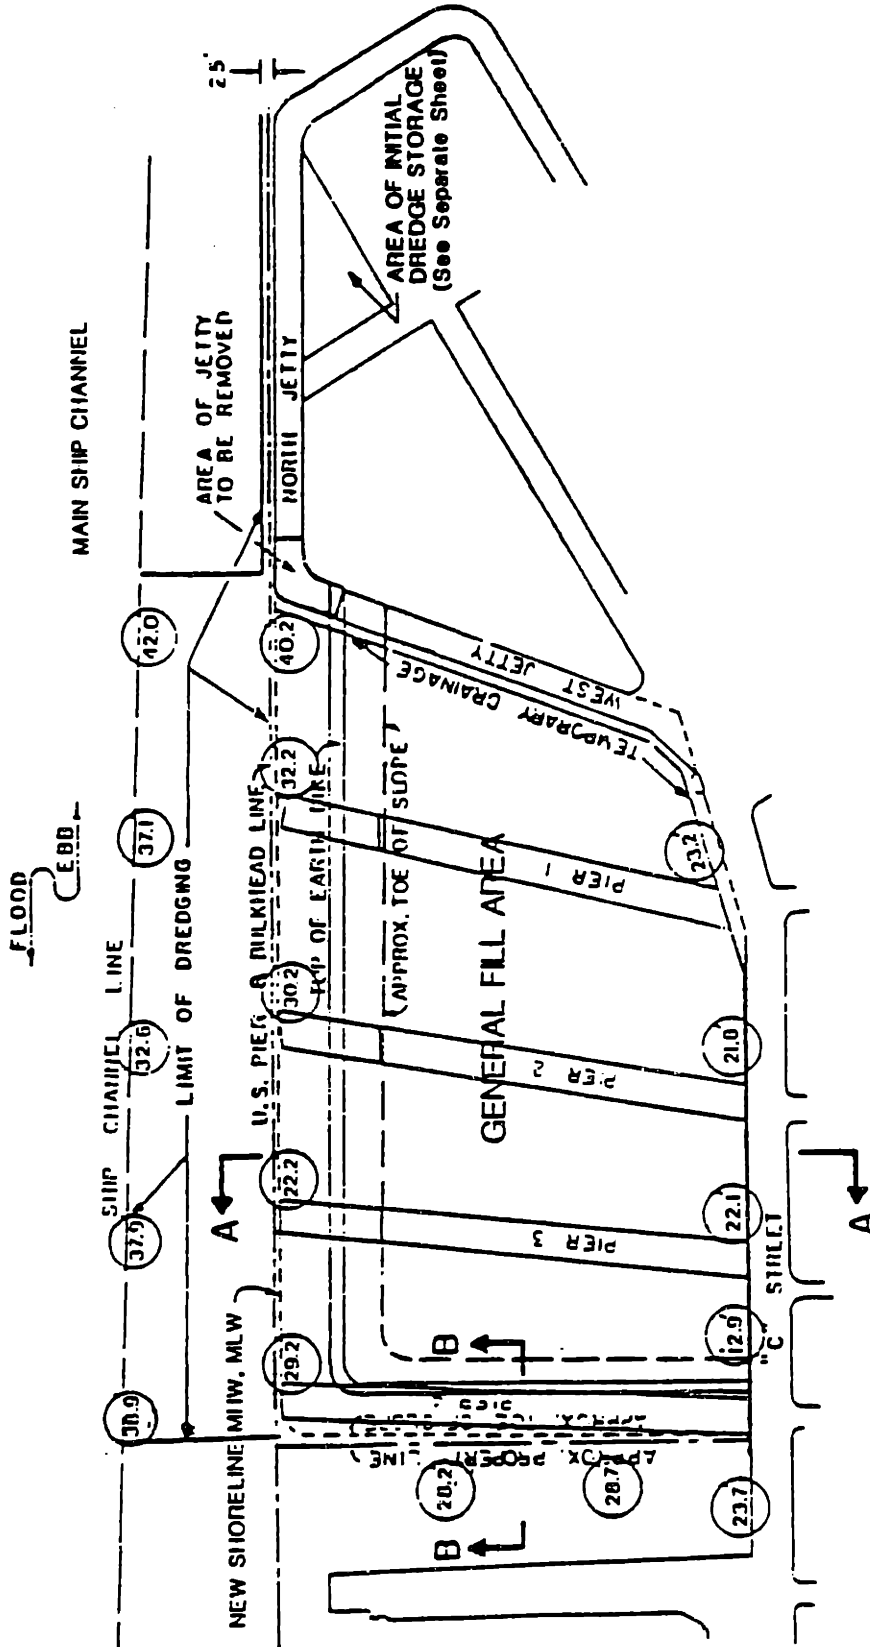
Site Plan of area 'SB12' (Cortell, Jason M., 1980)
